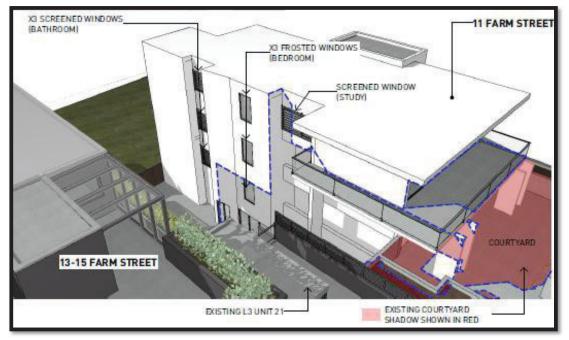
Existing overshadowing onto 11 Farm Street at 1pm.
